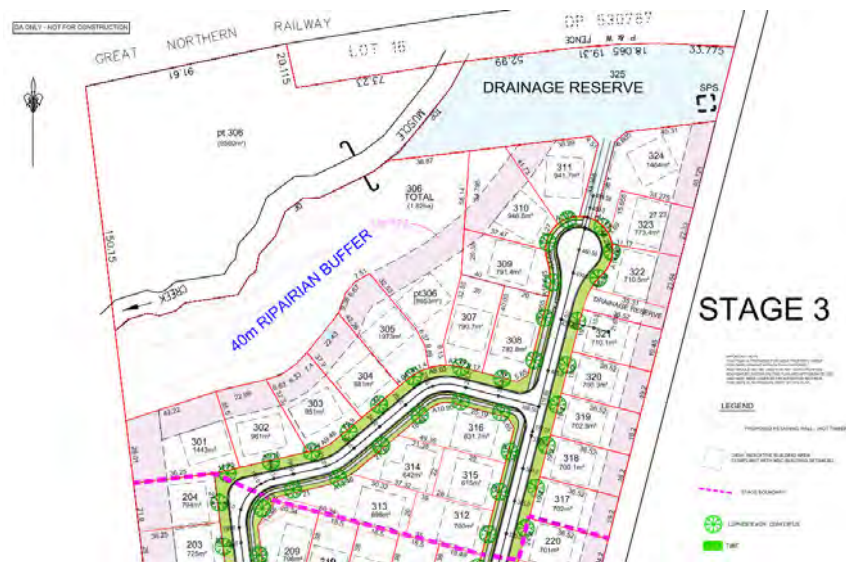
Stage Three Site Plan (Extracted from Subdivision Plans)
